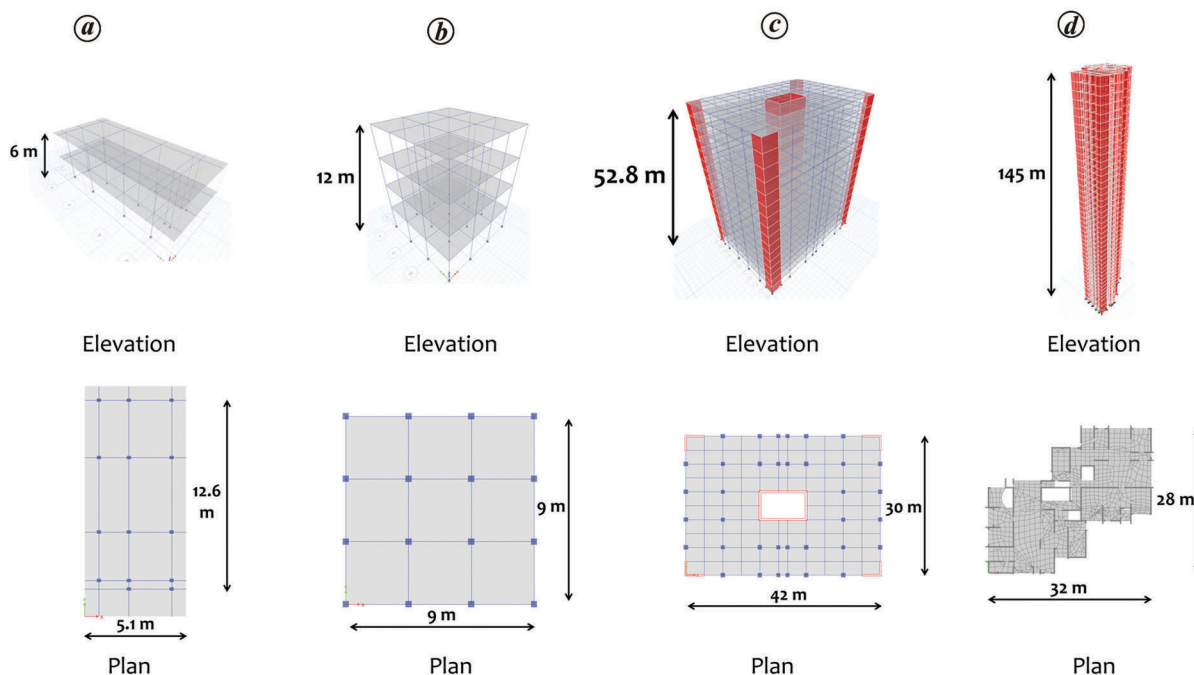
Plan and elevation of buildings under consideration: (a) G + 1; (b) G + 3, (c) G + 16, (d) B + G + 40 (G, ground; B, basement).
